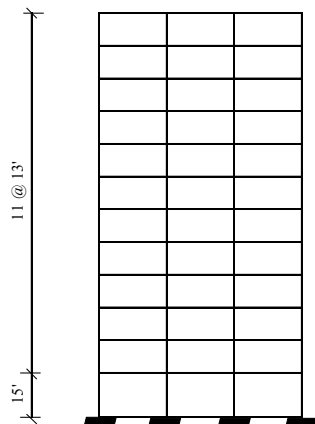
Baseline RC moment frame building typical 12-story elevation.
